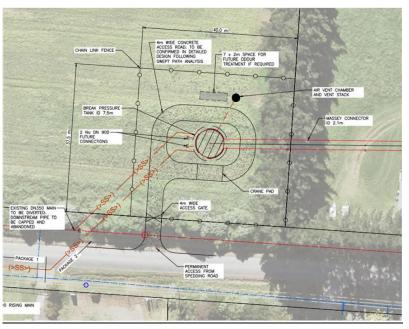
Break Pressure Tank Site Layout 8 Spedding Road
